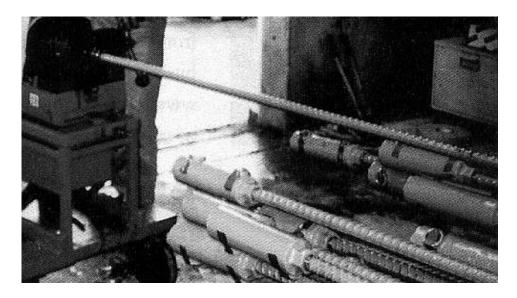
Epoxy-Coated Grouted Sleeve Couplers and Rebars [2.3]
